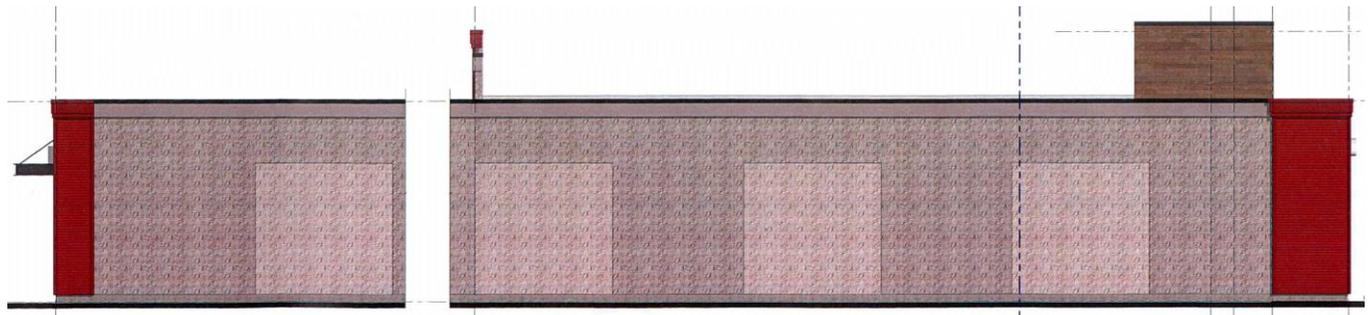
EXHIBIT "D" – PROPOSED BUILDING ELEVATIONS
